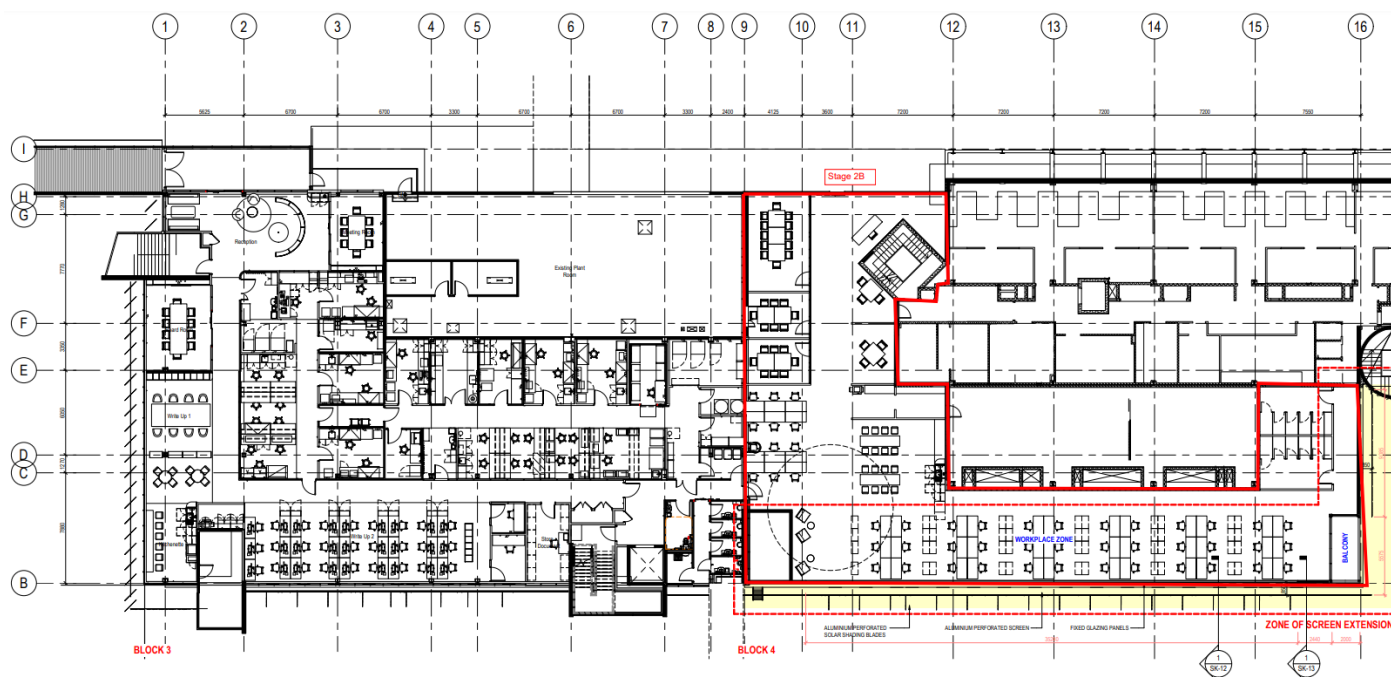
Proposed KR Level 4 Plan Stage 2B works (VVMF 2a/2b fit out) (Source: HDR)
